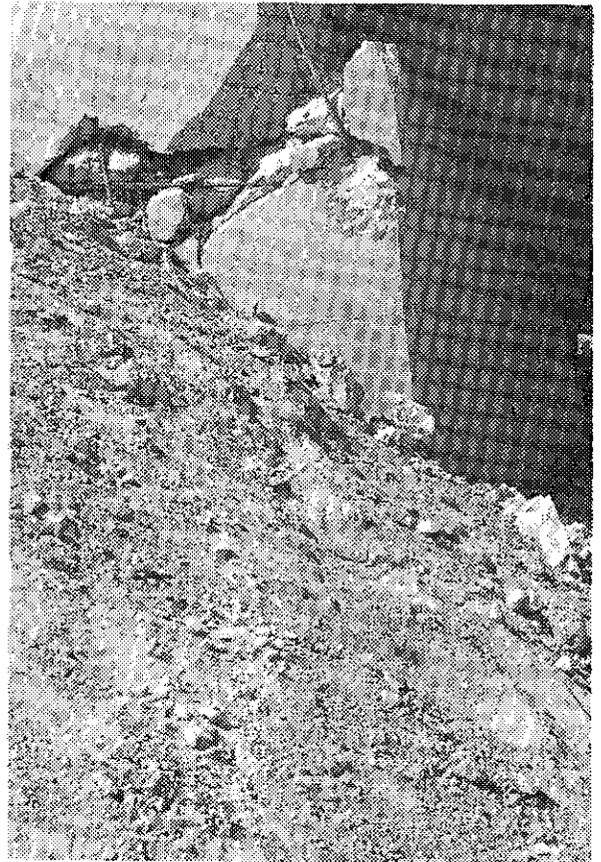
Westerly approach to Balboa Boulevard Overcrossing. Note abutment backfill settlement but lack of differential settlement between wingwall and abutment.
